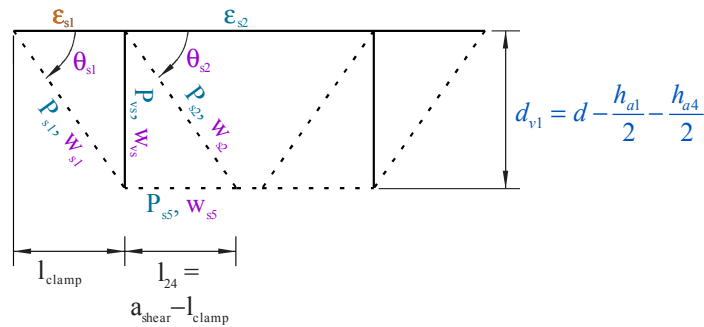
A truss analogy for a strengthened bridge pier cap
